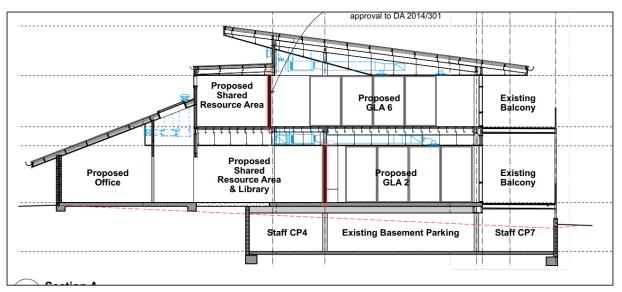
| Cross-section through the building showing the GLAs, staff areas and balcony (Source: Applicant's FIS)
